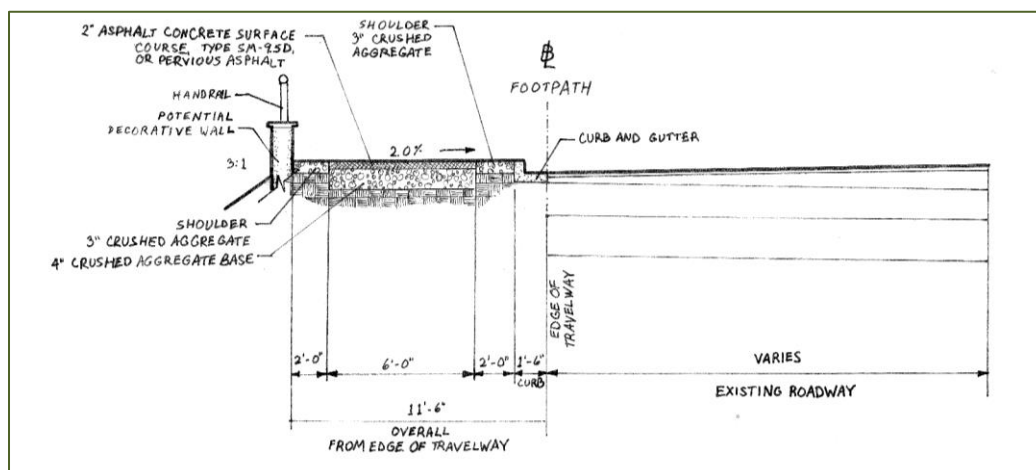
Possible Typical Section for Footpath with Retaining Wall for Fill Slope
